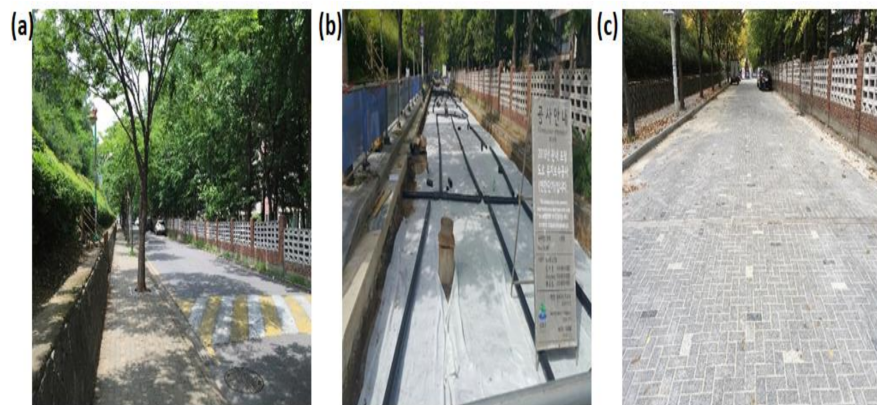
Shows the site of permeable pavement before and after construction; (a) Site before permeable pavement (asphalt pavement); (b) Site under the construction of permeable pavement; (c) Retrofitted permeable pavement (PICP).
